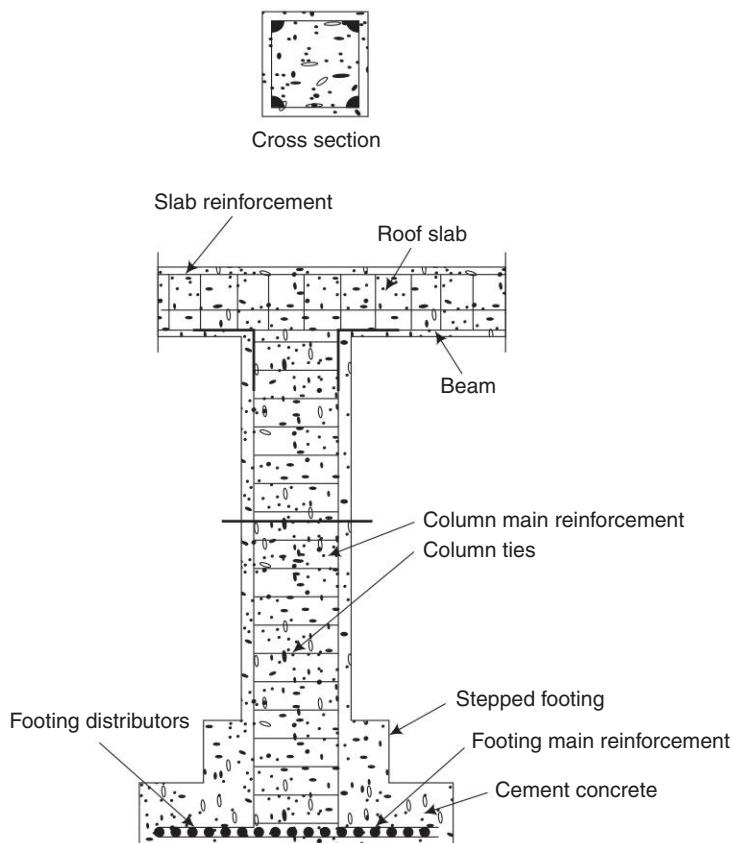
(c) Reinforced concrete column (Longitudinal section)
